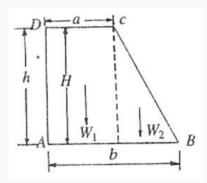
Masonry retaining wall having trapezoidal cross section. (Source: Das, Ghanshyam, 2002)
